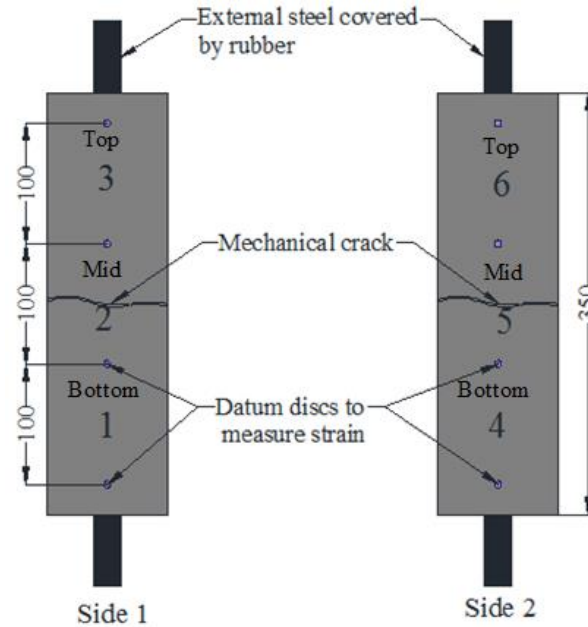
Test Specimen, positions of the pins and mechanical crack.
